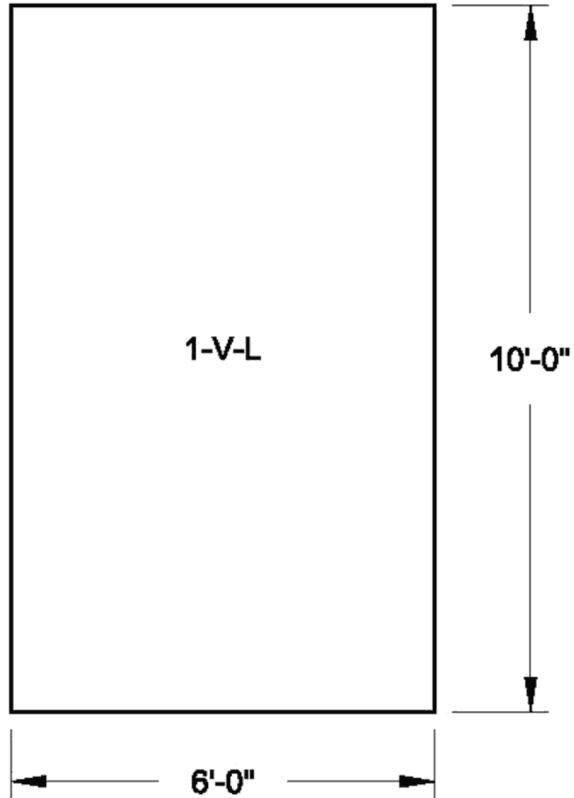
H.6-157 DGFO SV Roof 5 Looking Down
